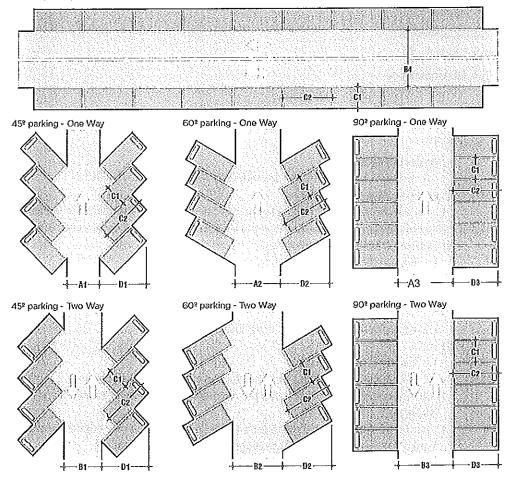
Parking Lot Stall, Aisle and Parking Bay Dimensions
